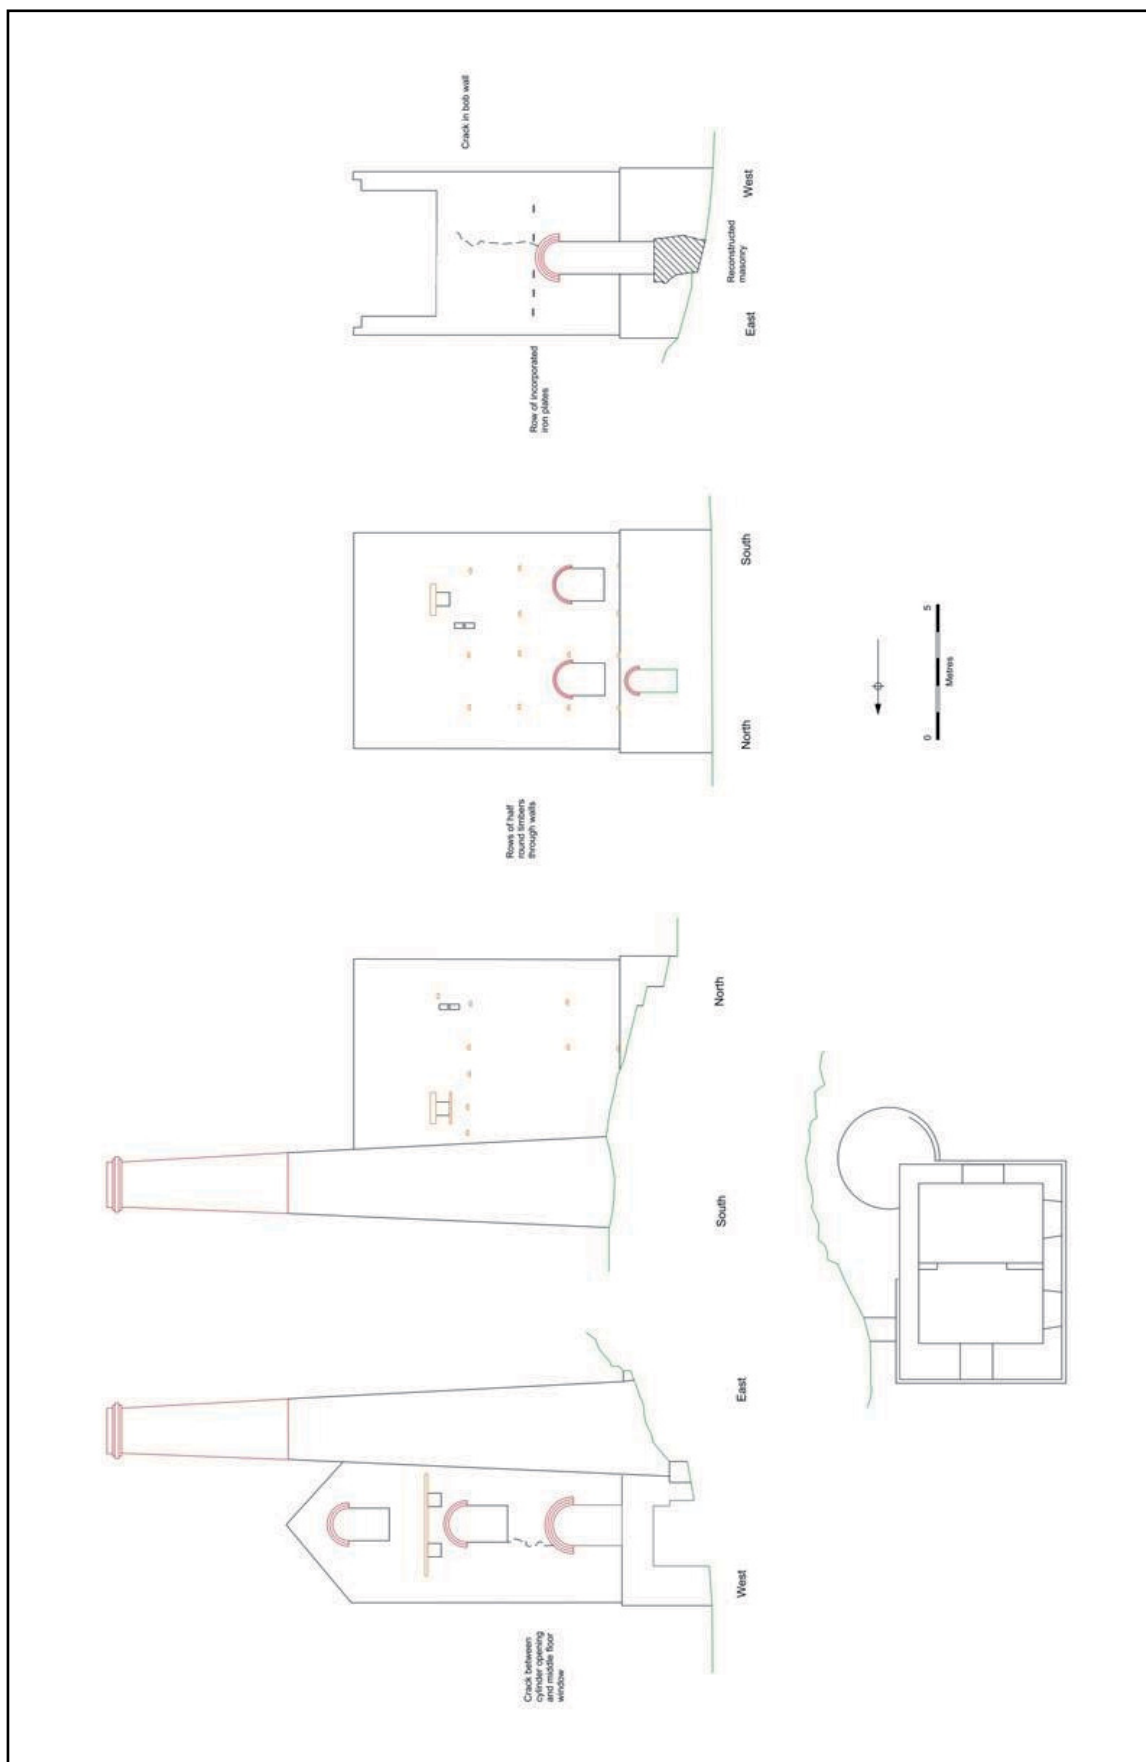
Plan and external elevations of Towanroath pumping engine house, Wheal Coates [190390].
